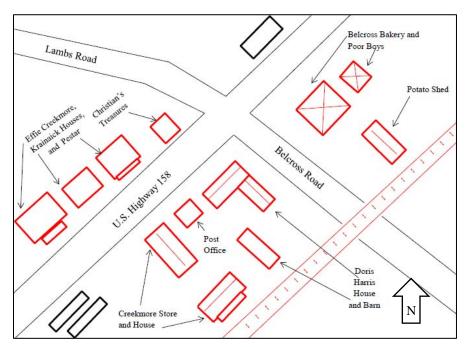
Site Plan for the Village of Belcross, Buildings Outlined in Red are Historic and those Outlined in Black are Non-Historic Buildings.
